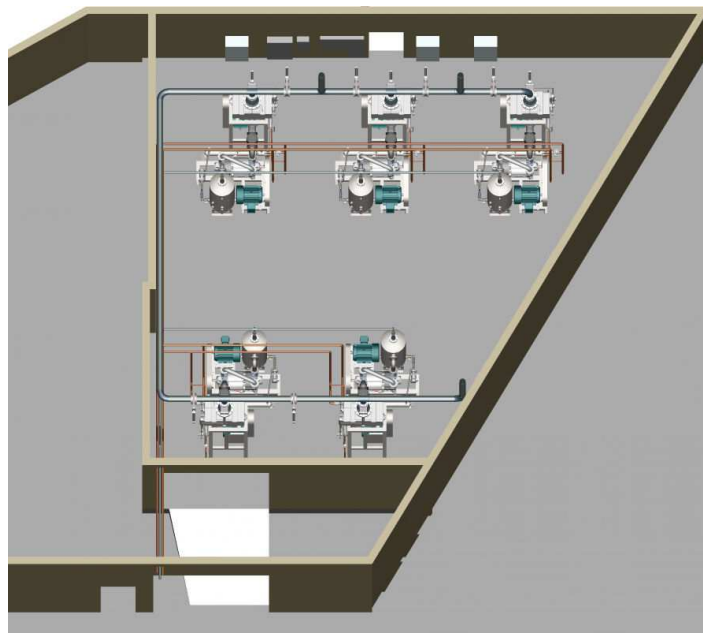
Physical integration of five warm vacuum pump skids in a new equipment room.
